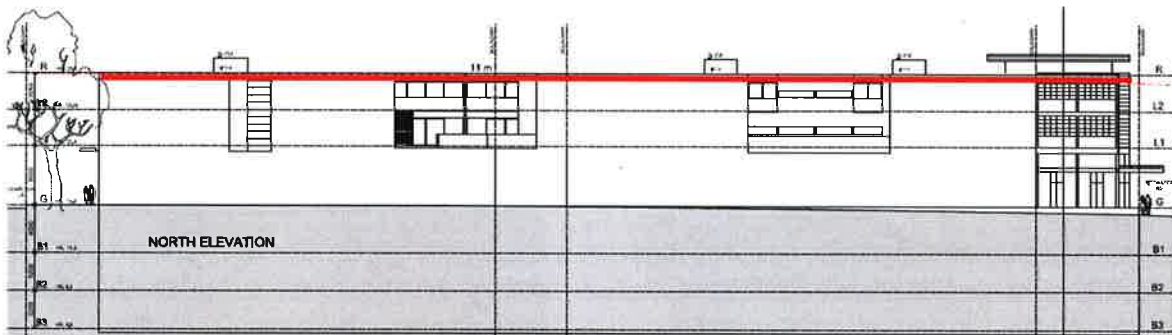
Plan extract showing extent of 11 metre building height breach northern façade
